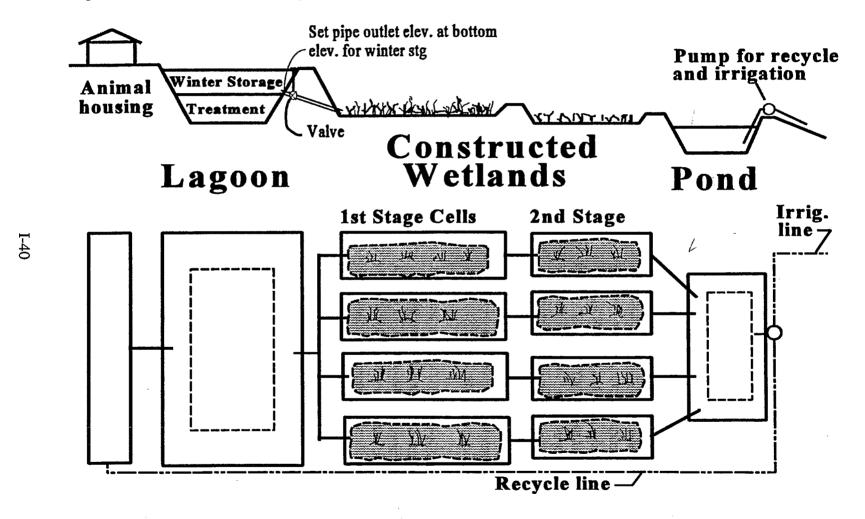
Typical layout of a lagoon / wetland / storage pond system for waste treatment
